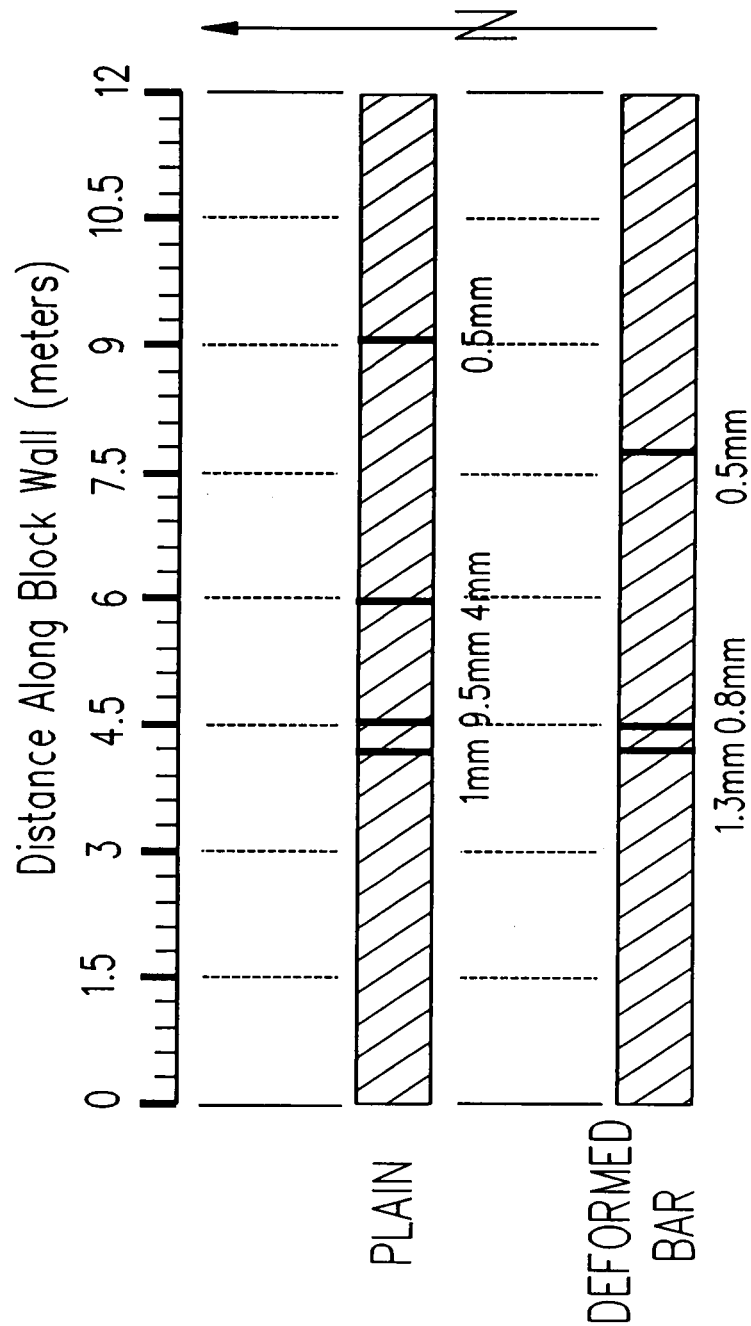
Crack Locations for Masonry Walls, Day 90 (after Lin, 1992b)
